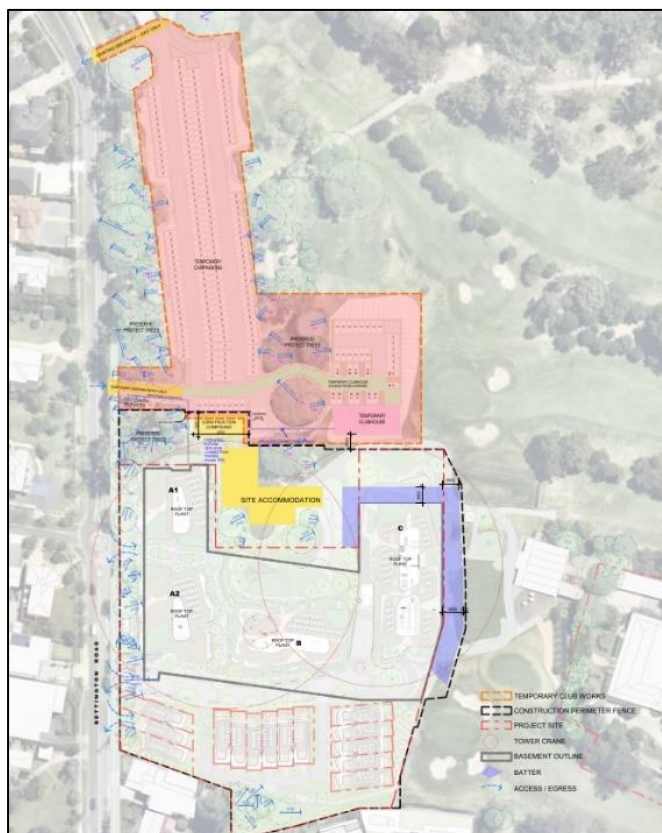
Temporary car park and club house site (light red) and adjoining construction compound / construction area (yellow buildings and surrounds) (Source: Construction Management Plan, Mirvac Design Architectural Plans November 2022)
